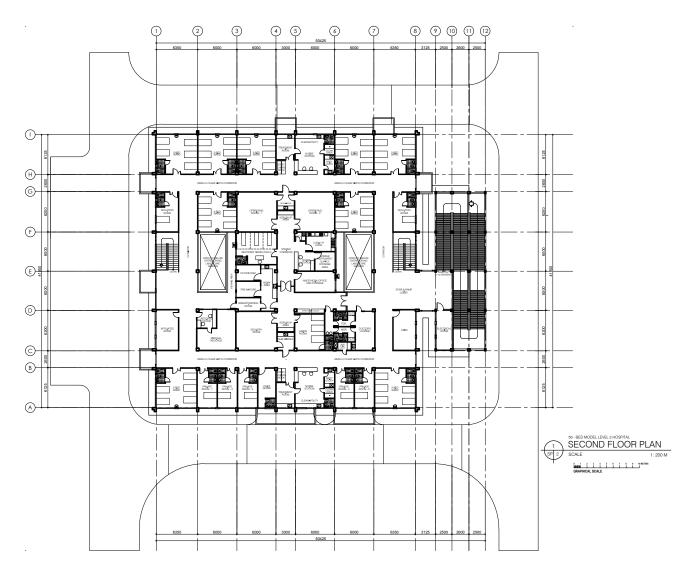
Two-Storey, 50-Bed Hospital Level One: Second Floor Plan
